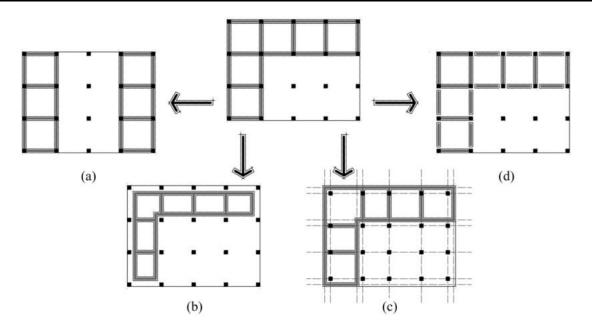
Effective measures to prevent torsion: (a) Changing the arrangement of spaces, (b) Changing the size of spaces, (c) Changing the arrangement of structural elements, (d) separating asymmetric walls from frame
